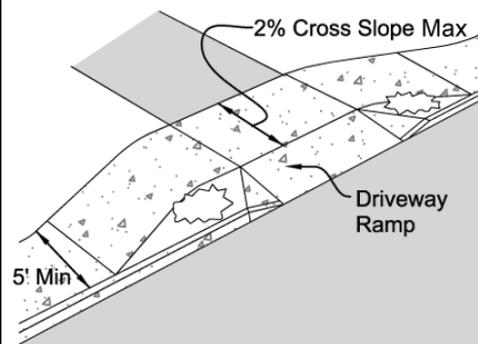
The sidewalk should extend through the driveway and should maintain the same slope, cross-slope, material, and scoring pattern as the adjacent sidewalk.
